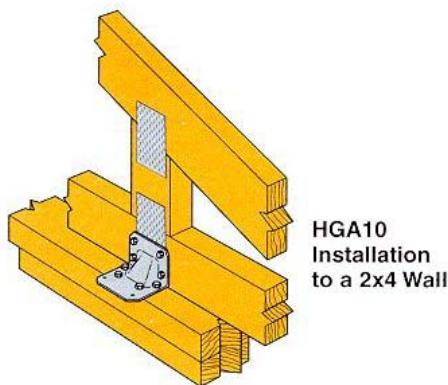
Hurricane Gusset Angle is designed to transfer uplift and lateral loads from gable end truss to the wall below (Simpson Strong Tie, 2000). This can be used as alternative to metal strap in Figure 3-13.
